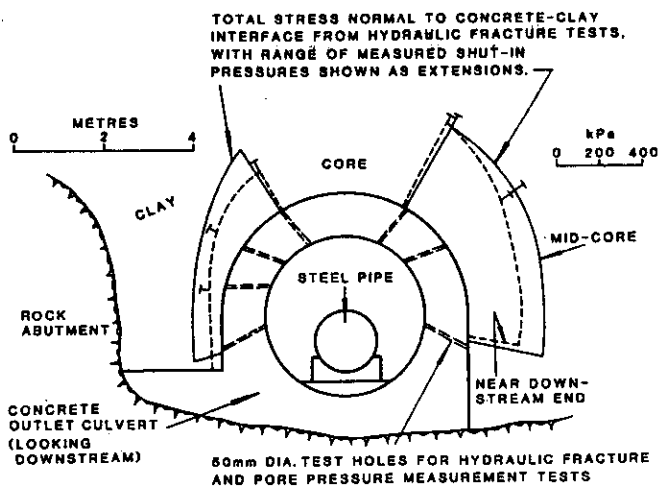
Hinze dam core/draw-off culvert area stress conditions
